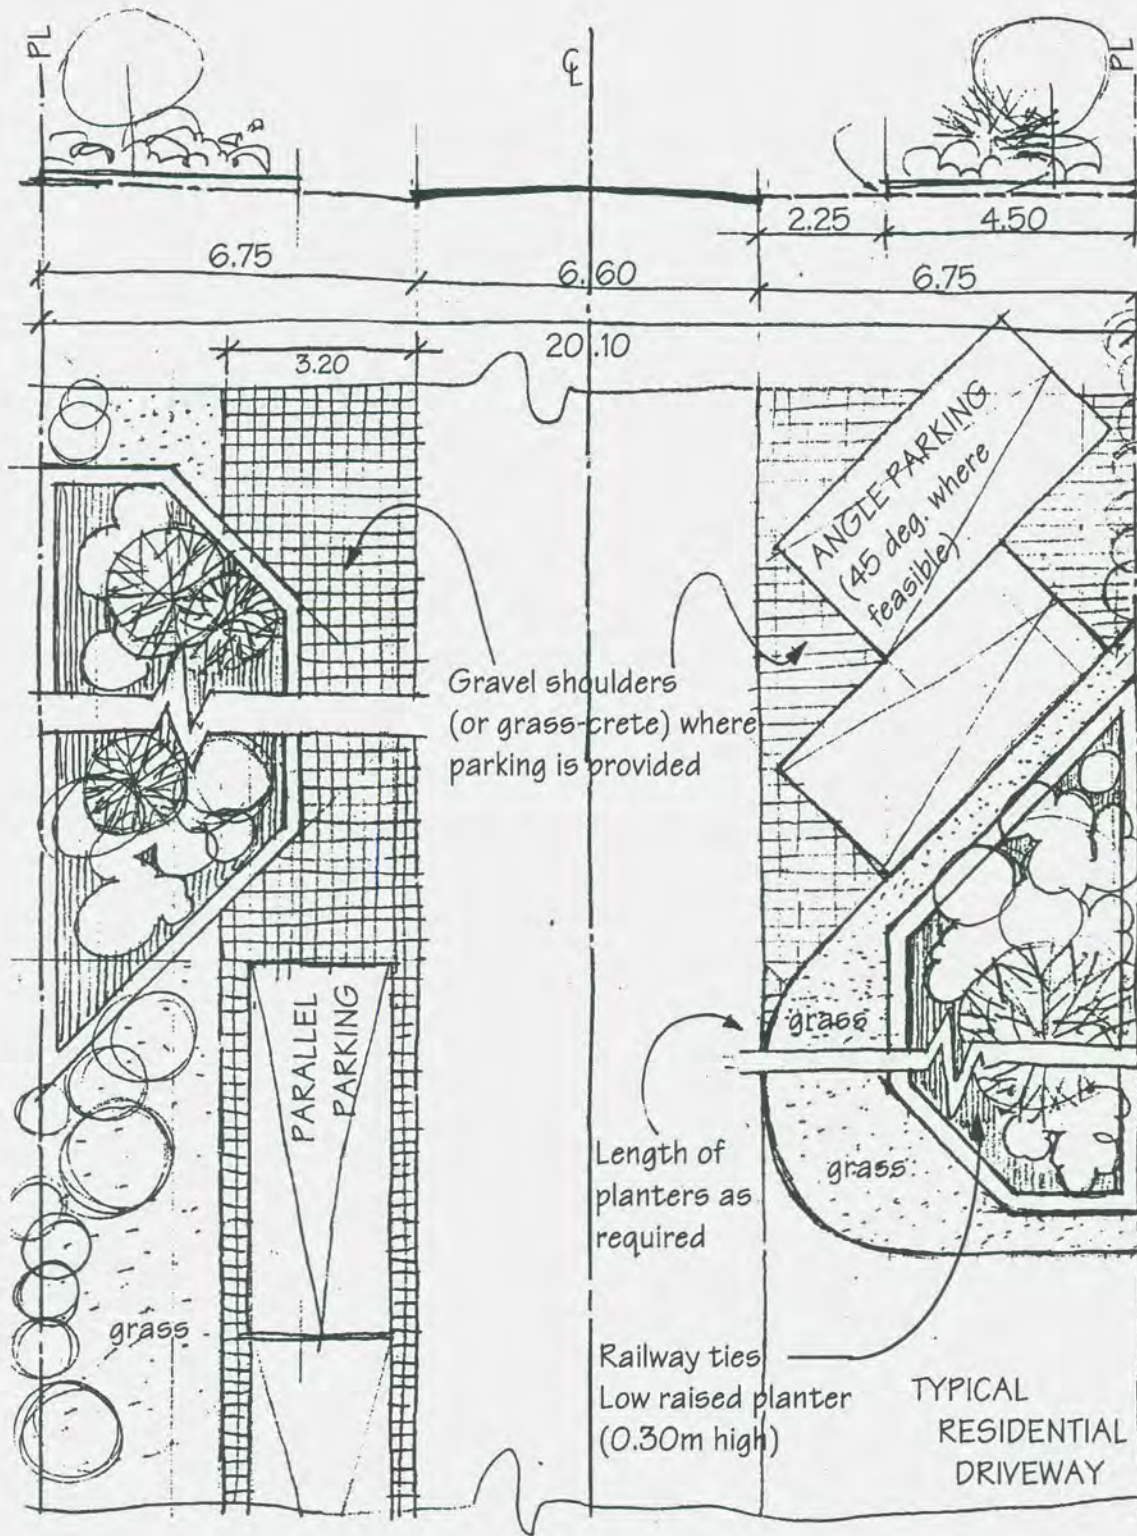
SEMI-RURAL STREET STANDARDS AND PARKING ON SHOULDERS
